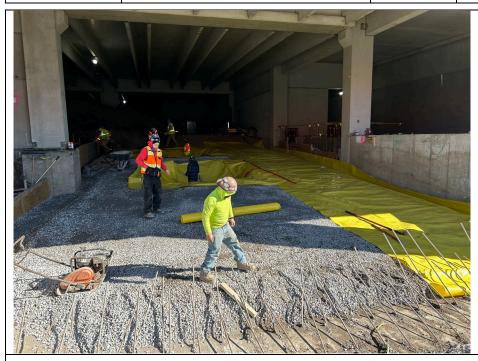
Leveling of stone and vapor barrier installation in grid B3.
